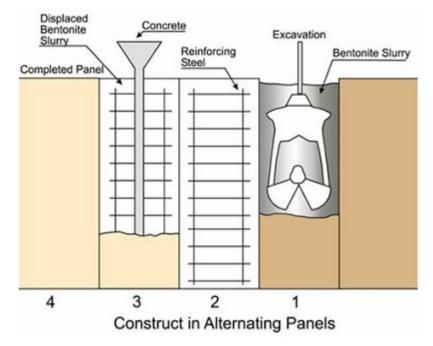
Westside Pump Station Shoring – Typical Slurry Wall Construction Method
